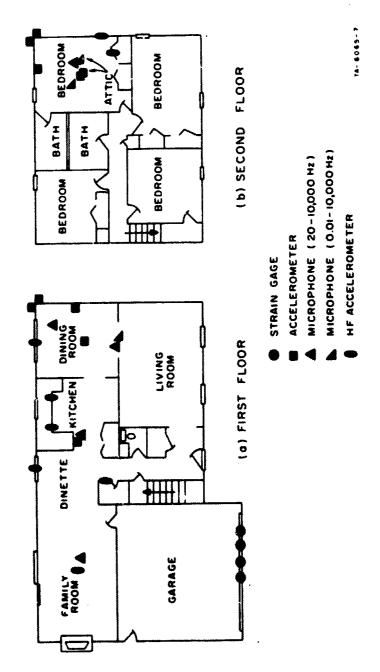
INSTRUMENTATION LOCATION, STRUCTURE E-2 FLOOR PLAN
